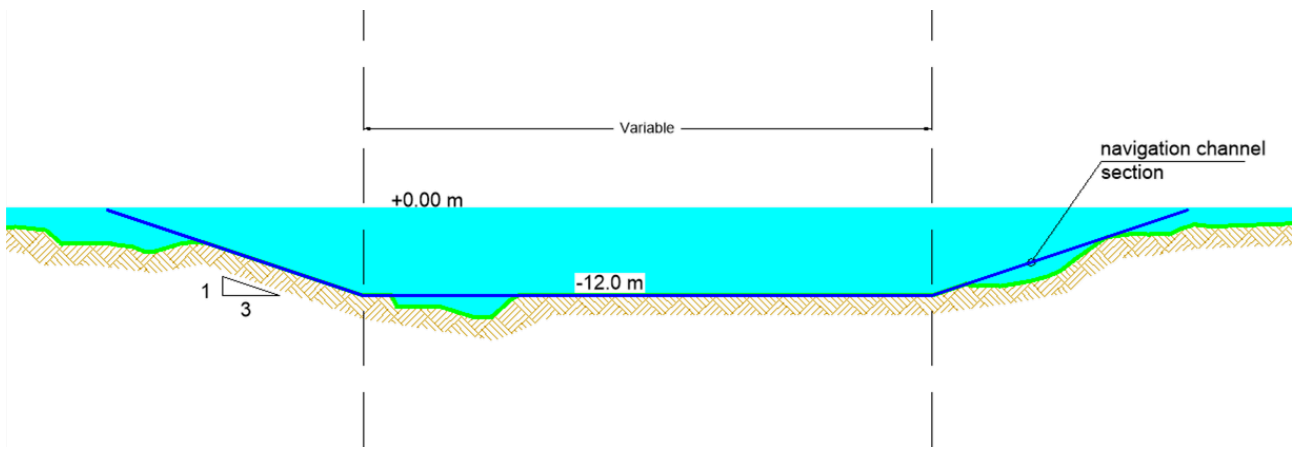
Re-design proposal: dredged section of navigation channel.
